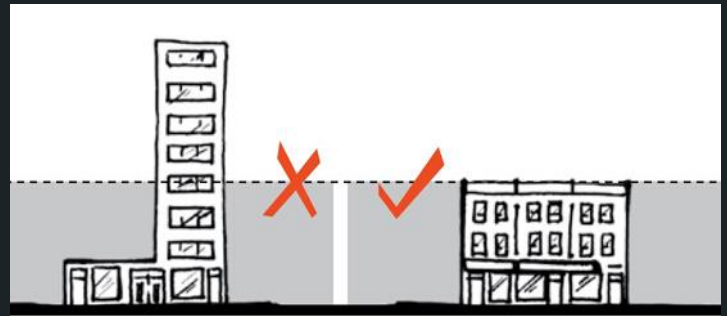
New and renovated buildings must be designed to be sympathetic to the district heritage attributes. For example, a one-storey podium with a high rise building is not part of the street character, whereas a continuous street wall of 3 to 5 storeys is. (Source: Queen Street West HCD Plan)
